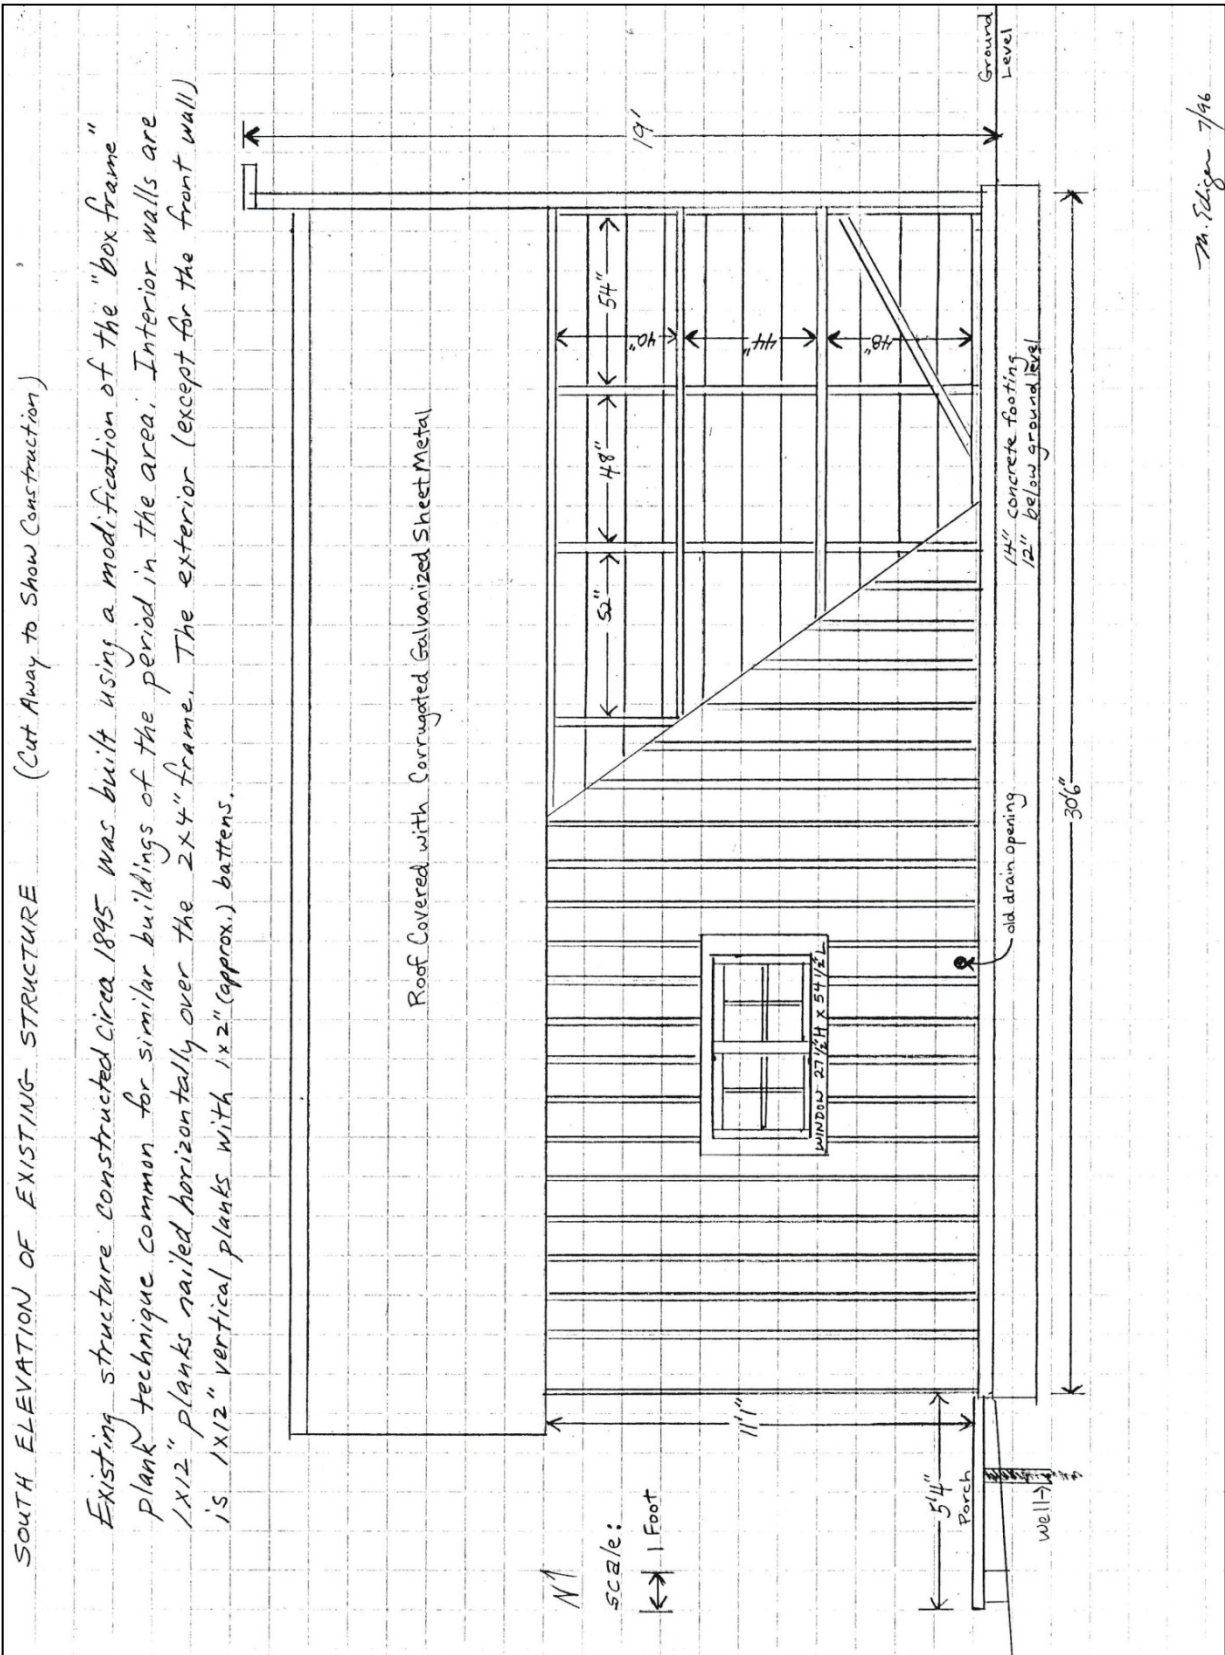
Wall construction detail, showing widely spaced framing members, vertical exterior boards, and horizontal interior boards. Courtesy Michael Ediger, July 1996.
